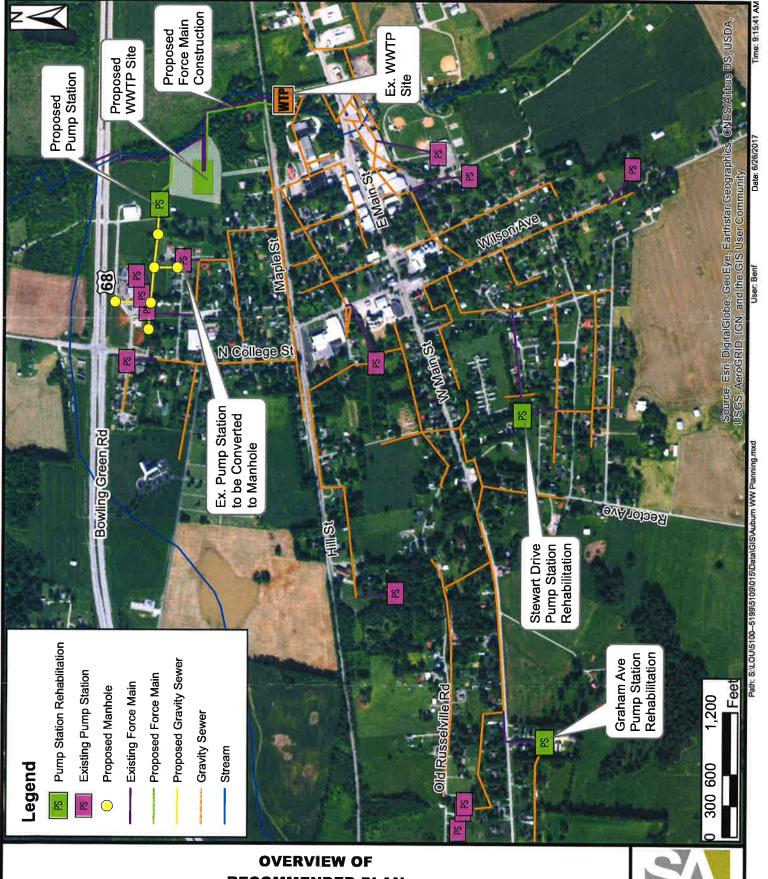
Auburn Wastewater Facilities Plan, Overview of New WWTP in the
